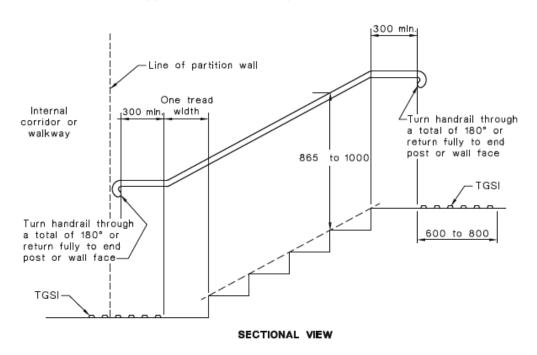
(B) STAIRWAY LOCATION AND HANDRAIL EXTENSIONS AT END OF STAIRWAY OTHER THAN AT LINE OF BOUNDARY
